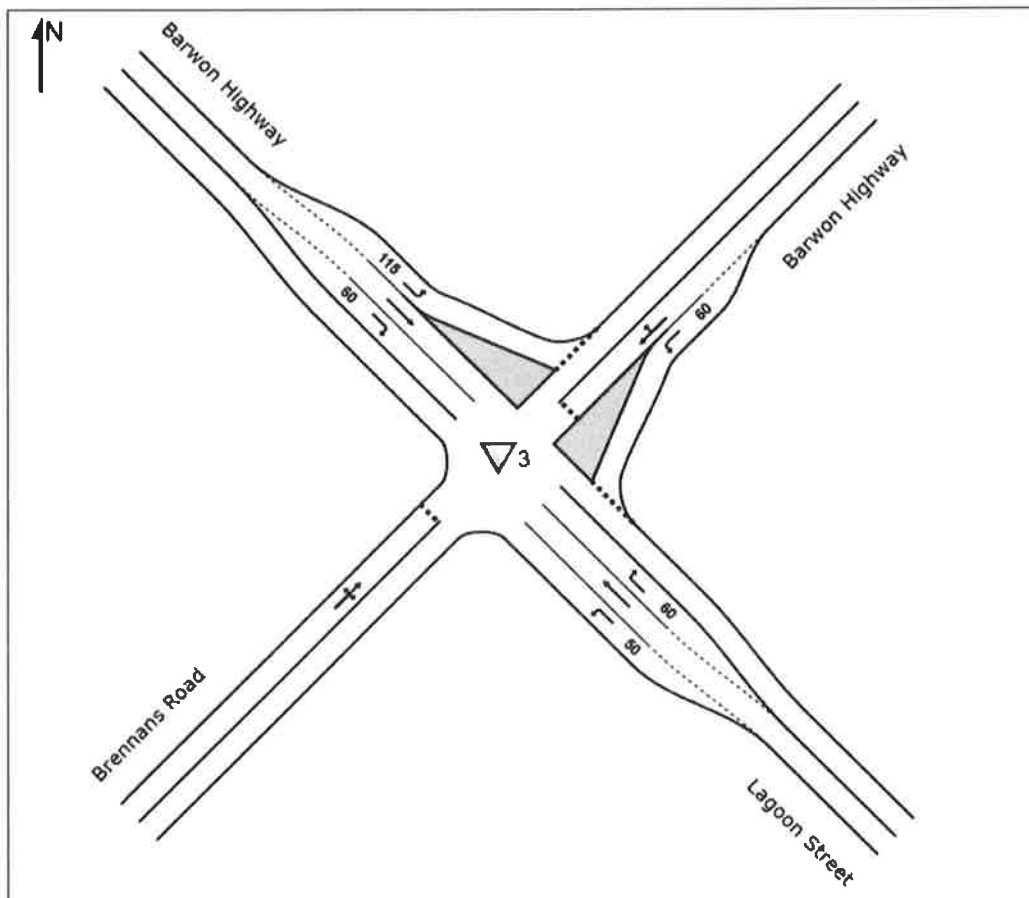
Barwon Highway / Brennans Rd / Lagoon Street Intersection Layout
